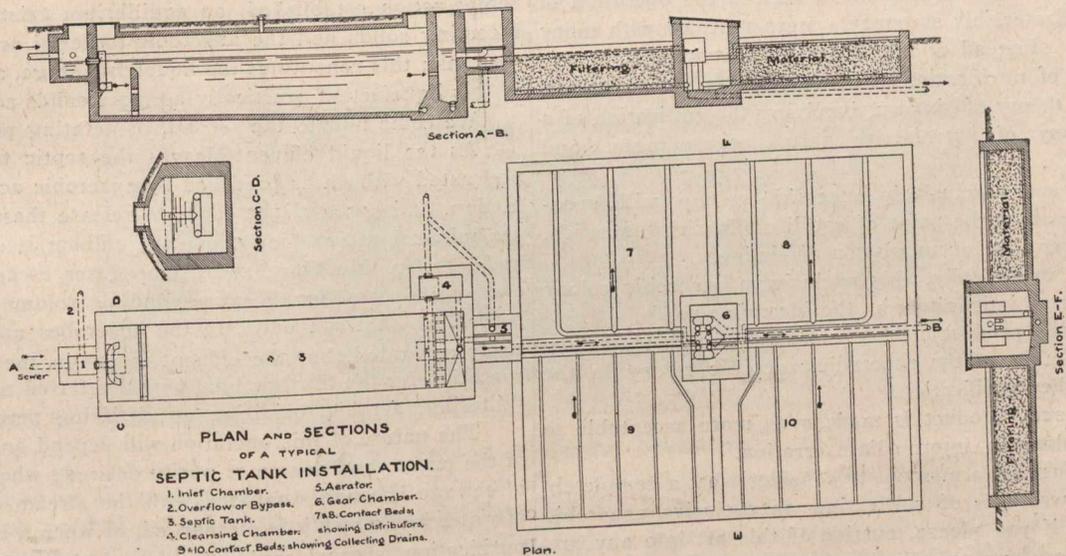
Plan and Sections of Typical Septic Tank System.
